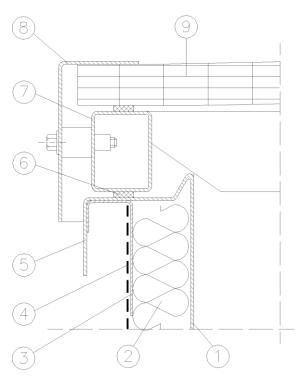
Method of sealing with roof membrane or roofing paper (DETAIL A).
